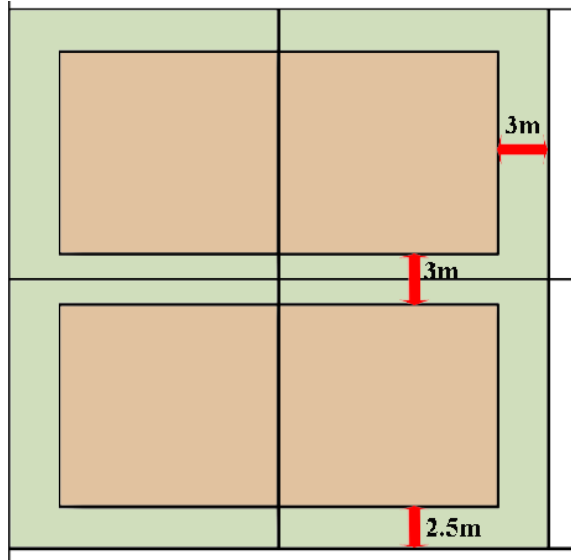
23 Building Arrangement of Setback 1.5m, 3m and 2.5m
